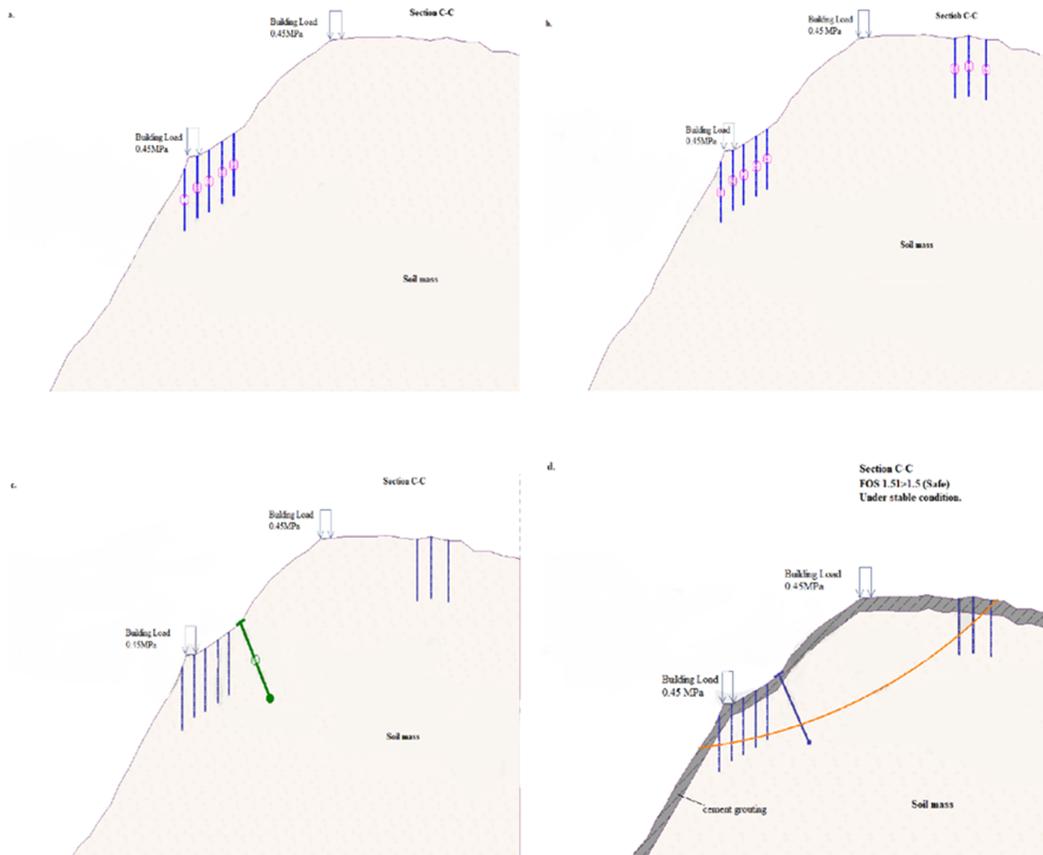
Steps involved in section C-C, (a) and (b) installation of piles. (c) Installation of anchors. (d) Stability check after grouting and all remedies.
